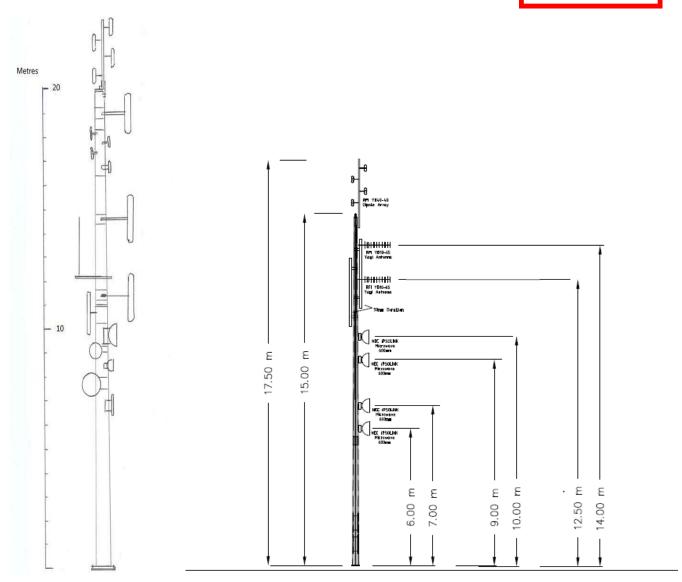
Elevation plan of previous tower (left) compared to proposed replacement tower and ancillary components (right)
